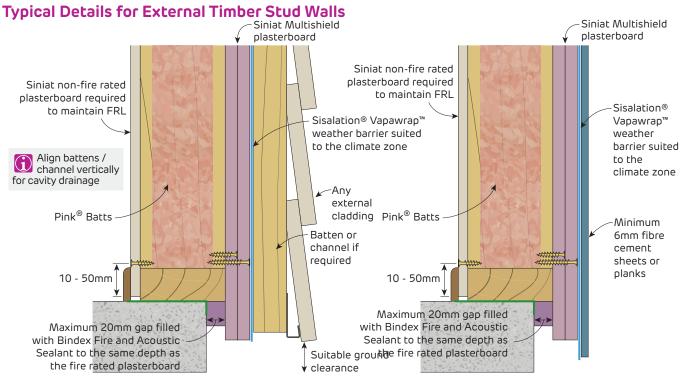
External Timber Stud Wall Base - Alternative Detail
